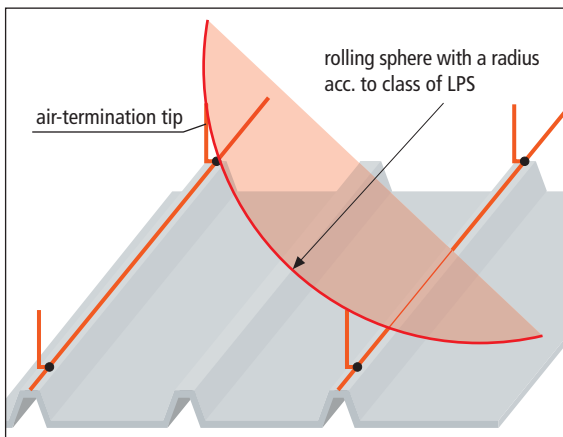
Air-termination system on a metal roof – Protection against holing
